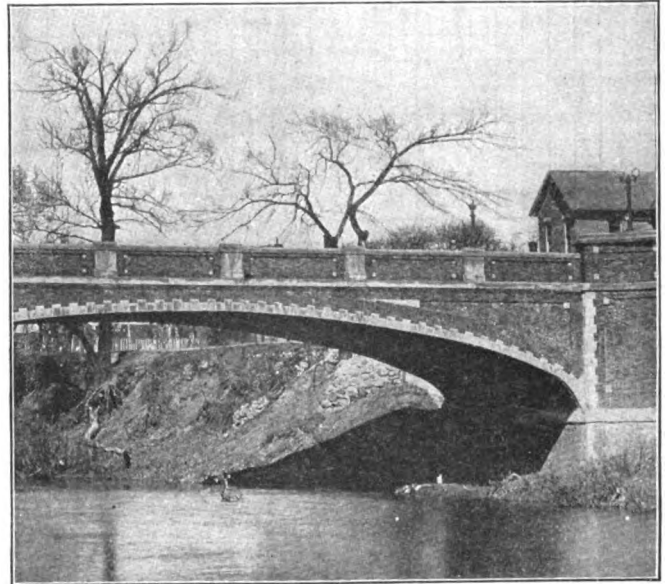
DETAIL VIEW, TENNESSEE AVE. BRIDGE
